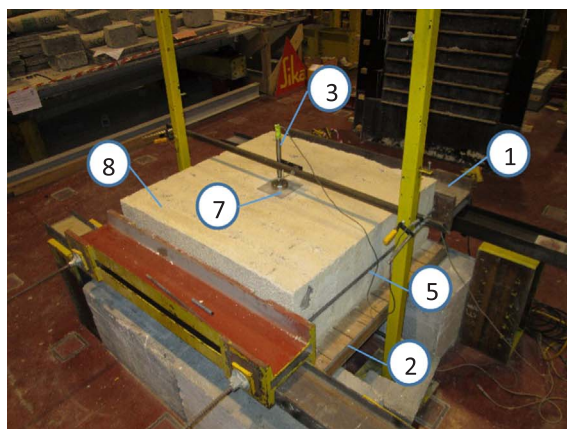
Anchor pull-out test assemblage. 1 Distribution beam. 2 Wooden substrate. 3 Disp.transducer. 4 Disp. transducer. 5 Diwydag bar. 6 Switch-over piece. 7 Anchoring system. 8 Masonry specimen.
